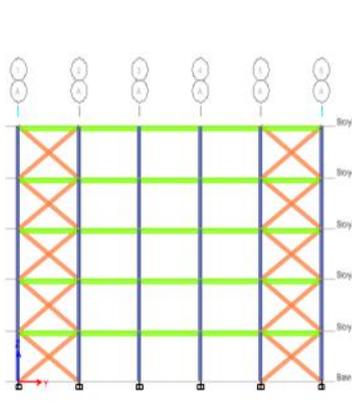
Model3 floating column building with bracing sides fig.7: model4 floating column building with shear wall
